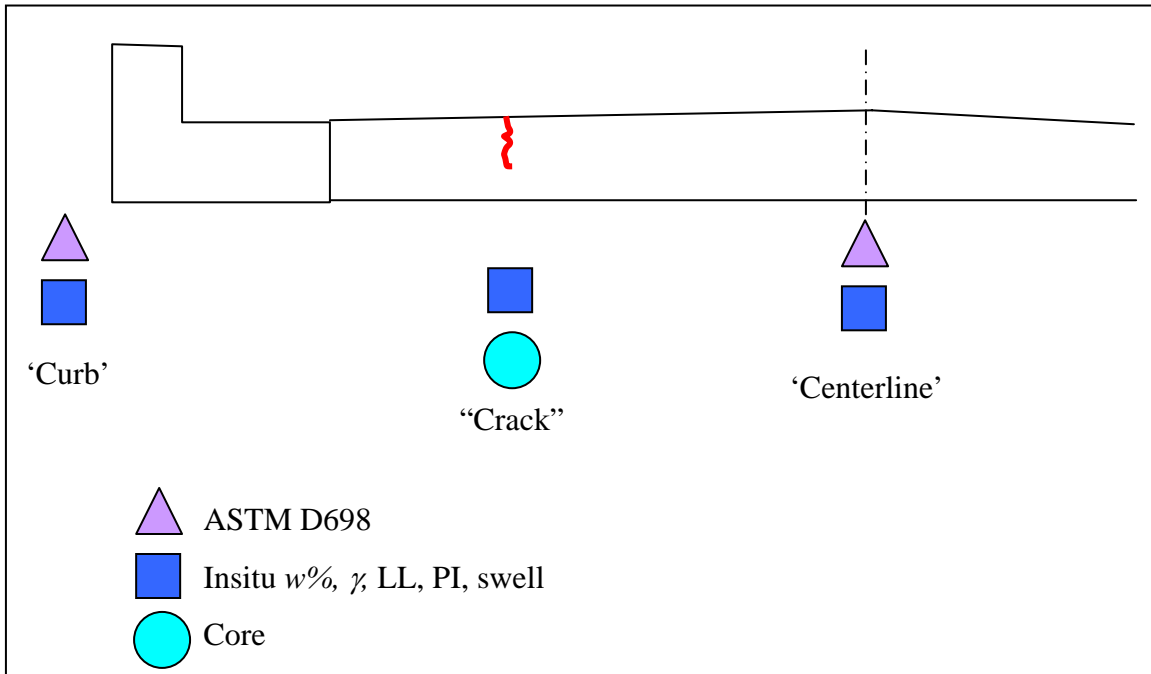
Sampling Plan and Tests at Tollgate Crossing Locations
